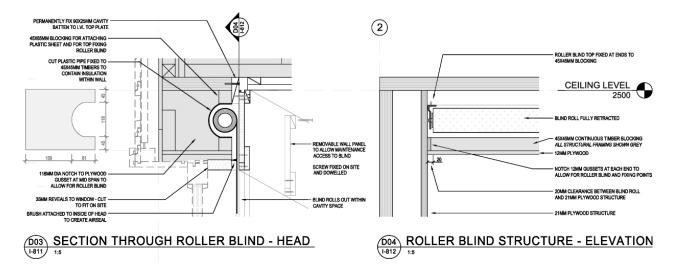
details for the in-wall roller blind, showing removable panel and the need to notch structural gusset plate
